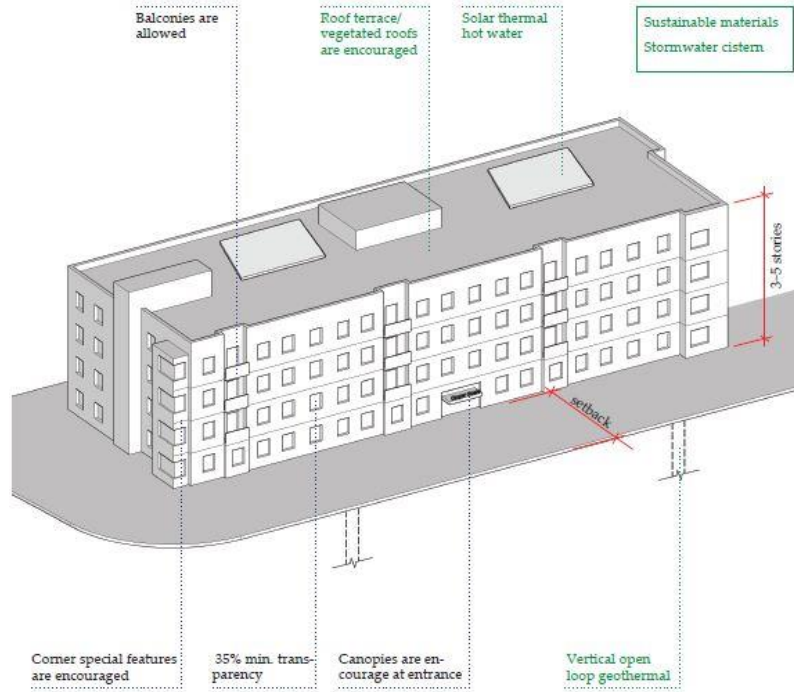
Multi-family residential buildout example, source: (EDAW Inc., 2009)
